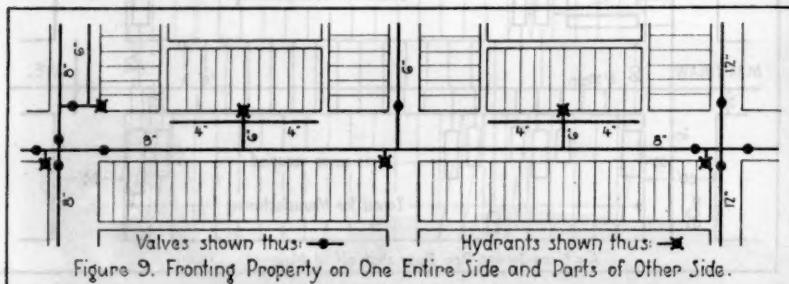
FRONTING PROPERTY ONE SIDE AND PARTS OF OTHER SIDE OF BLOCK
